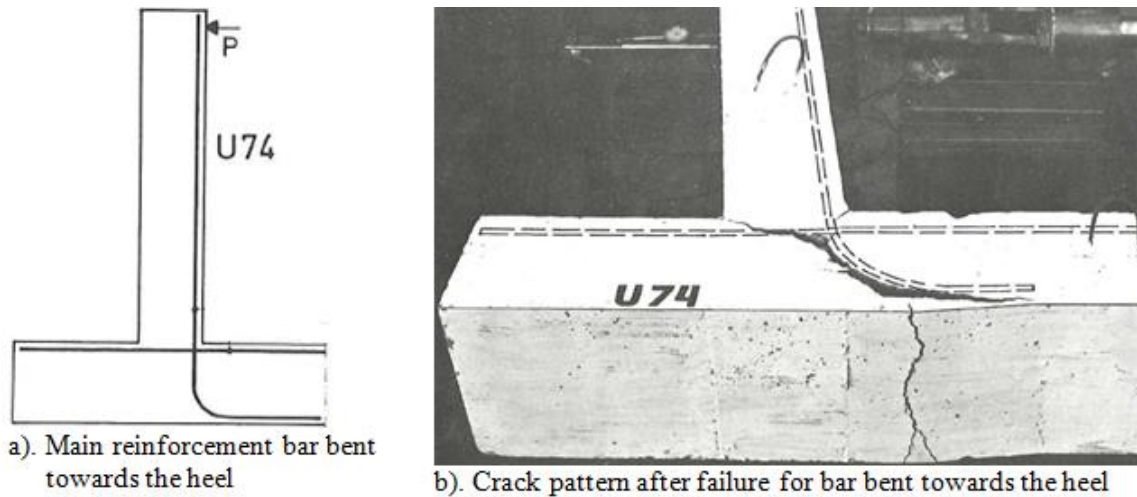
Corner detail with main bar bent towards the heel (Nilsson, 1973)
